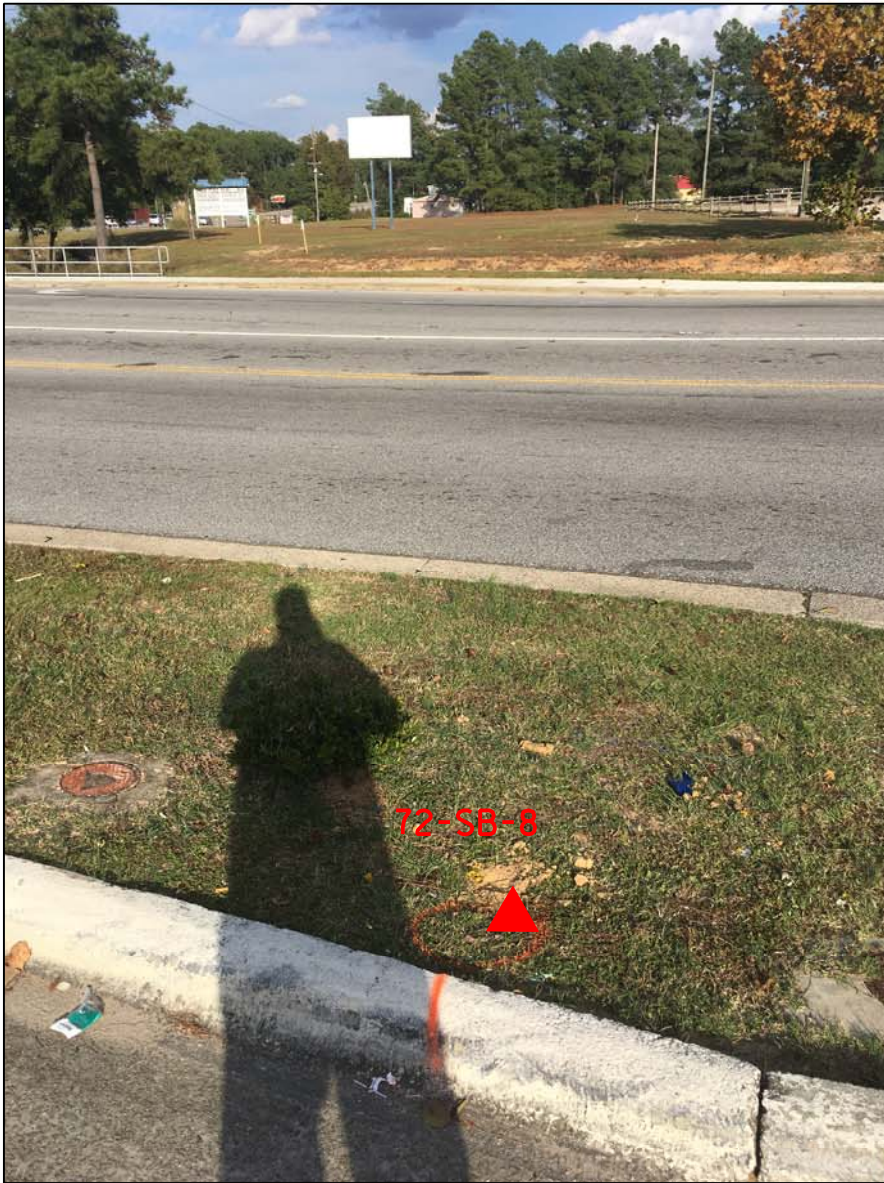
VIEW OF SOIL BORING LOOKING EAST
